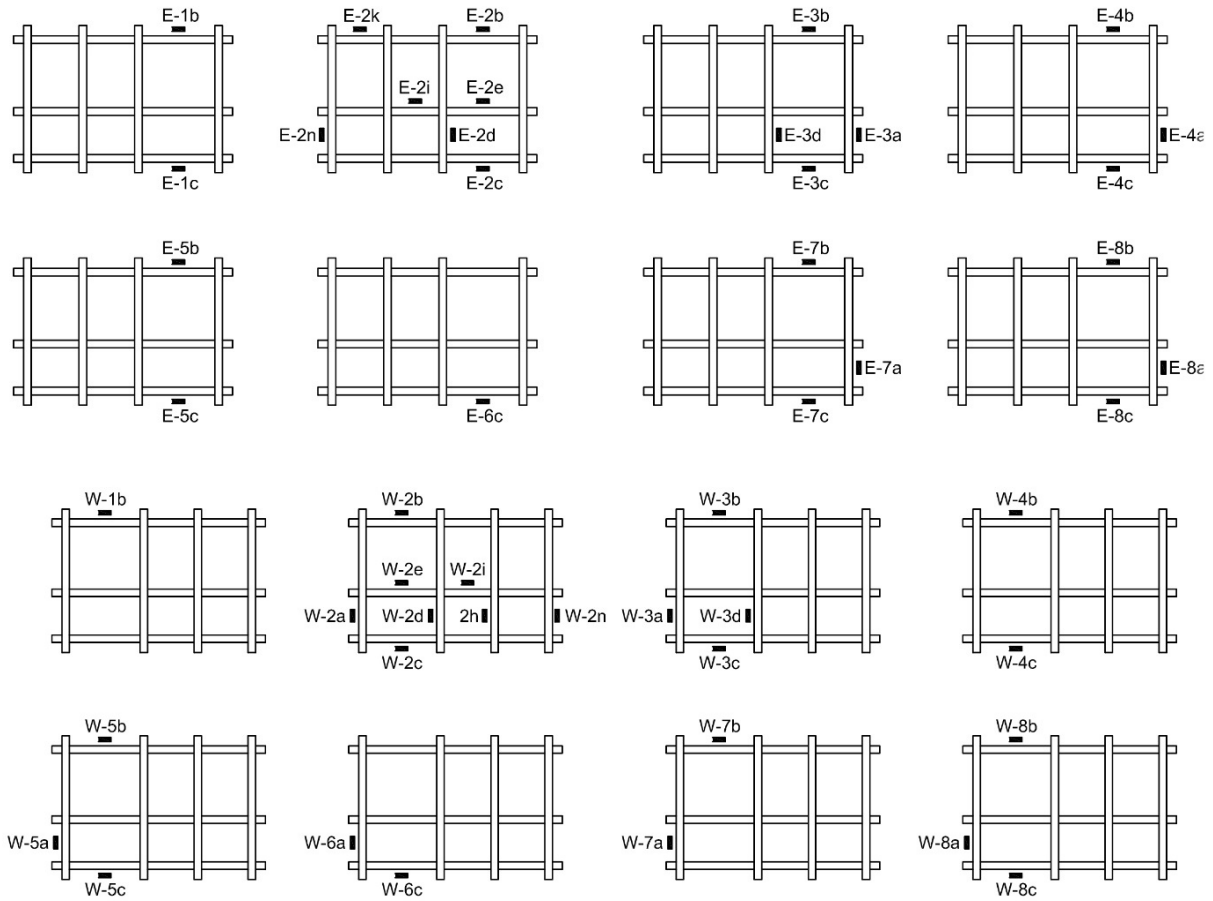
Shear Wall No. 2 – WWR Grid Strain Gauge Labels
